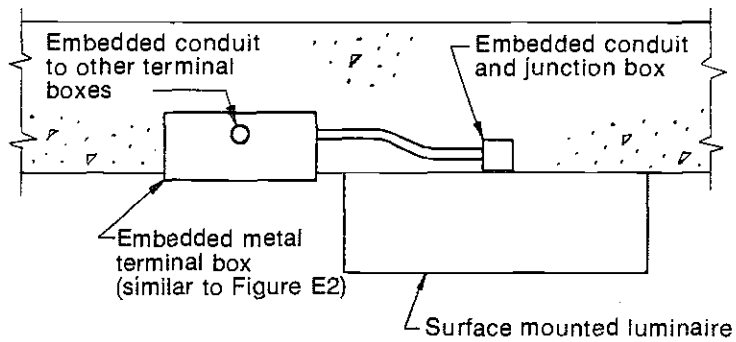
TYPICAL LAYOUT OF EMBEDDED TERMINAL BOX AND SURFACE MOUNTED LUMINAIRE
